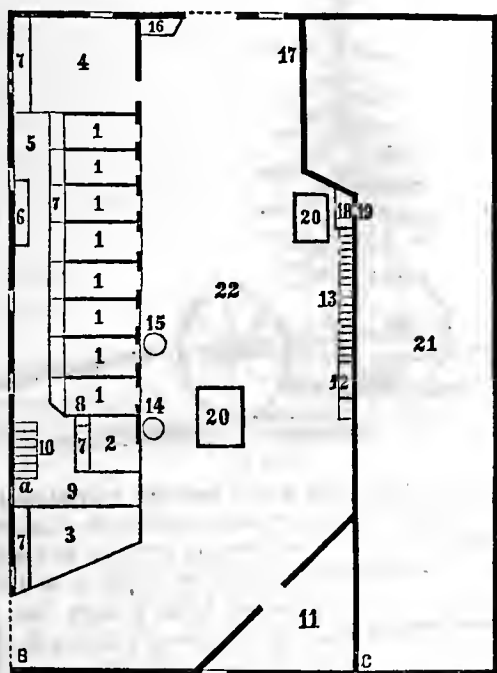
GROUND PLAN OF BASEMENT—36 by 70 feet, 8 foot walls...
